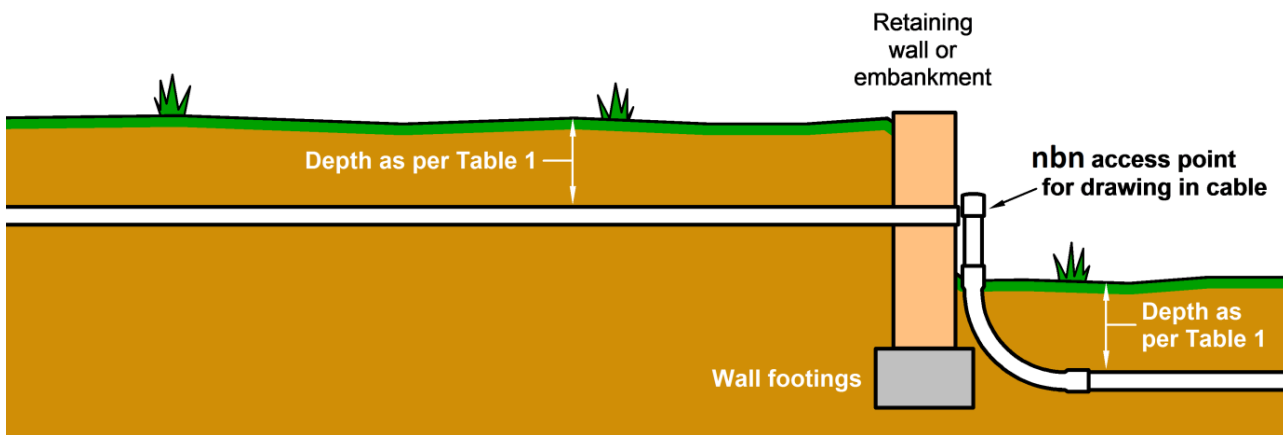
Trenching/Conduit Arrangement with a retaining wall of greater than 1 m
